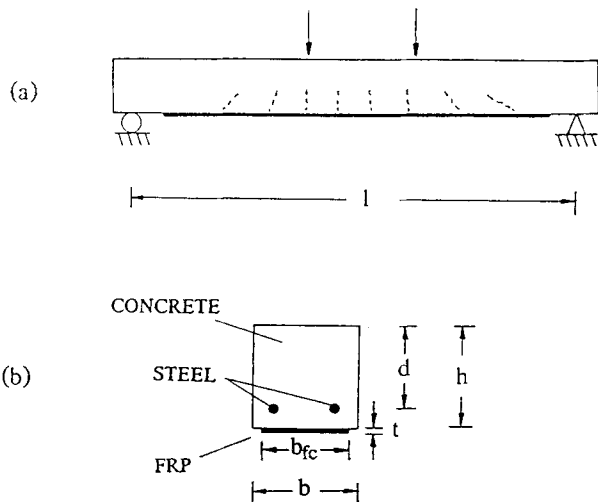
(a) A concrete beam of span l strengthened with FRP sheet; (b) the cross-section of the beam in (a).
